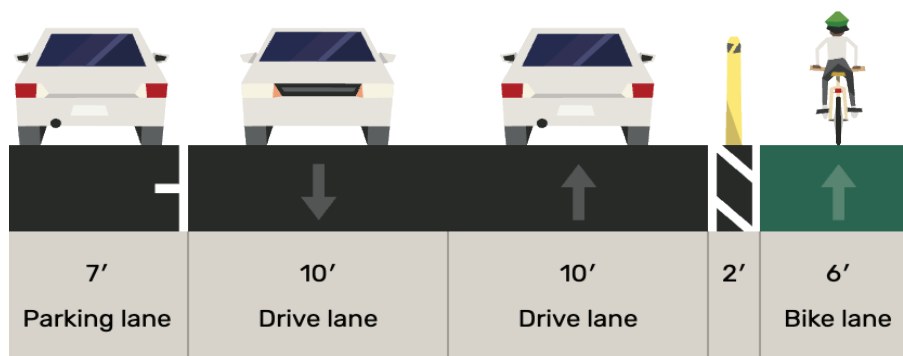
Proposed cross-section at Moreno Drive to Spalding
